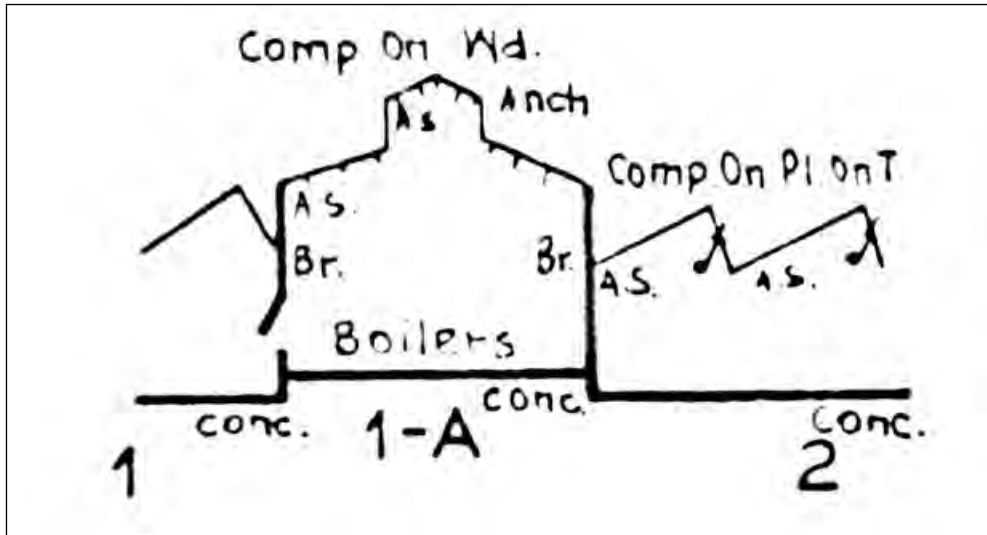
Factory Mutual Insurance Co. *Mill Realty Co.* 1965. South-north cross-section through Buildings 1, 1-A and 2. Scale: 1 inch= 10 feet (approximately).
